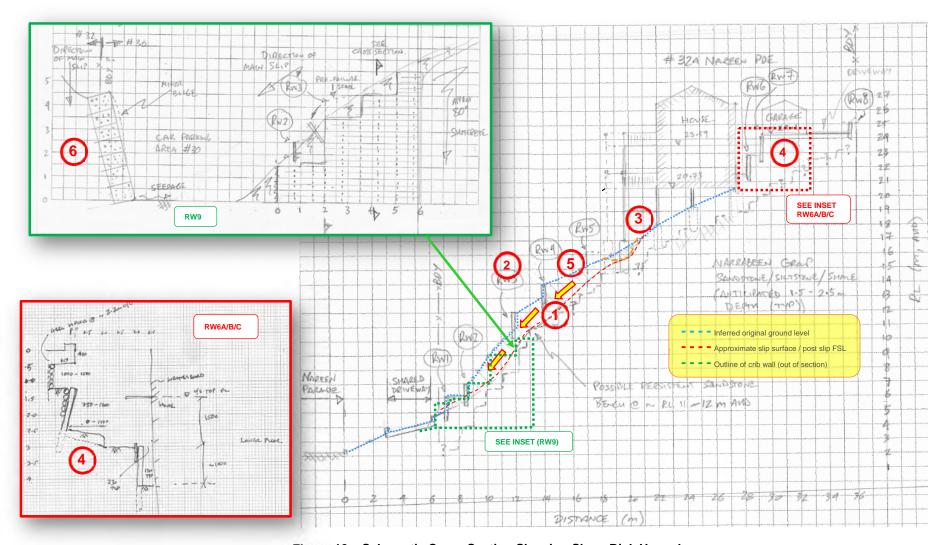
Schematic Cross Section Showing Slope Risk Hazards
